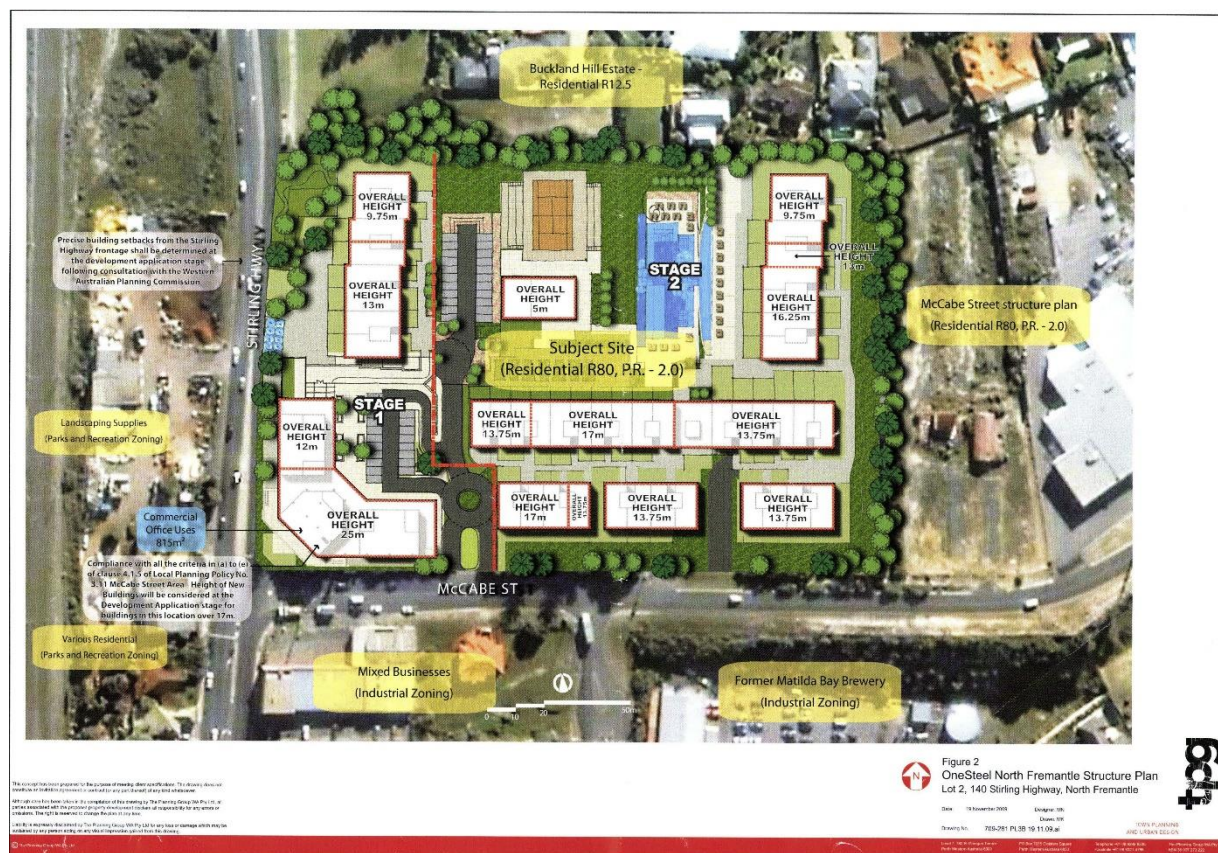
Adopted DA18 140 Stirling Highway Structure Plan (2009)
